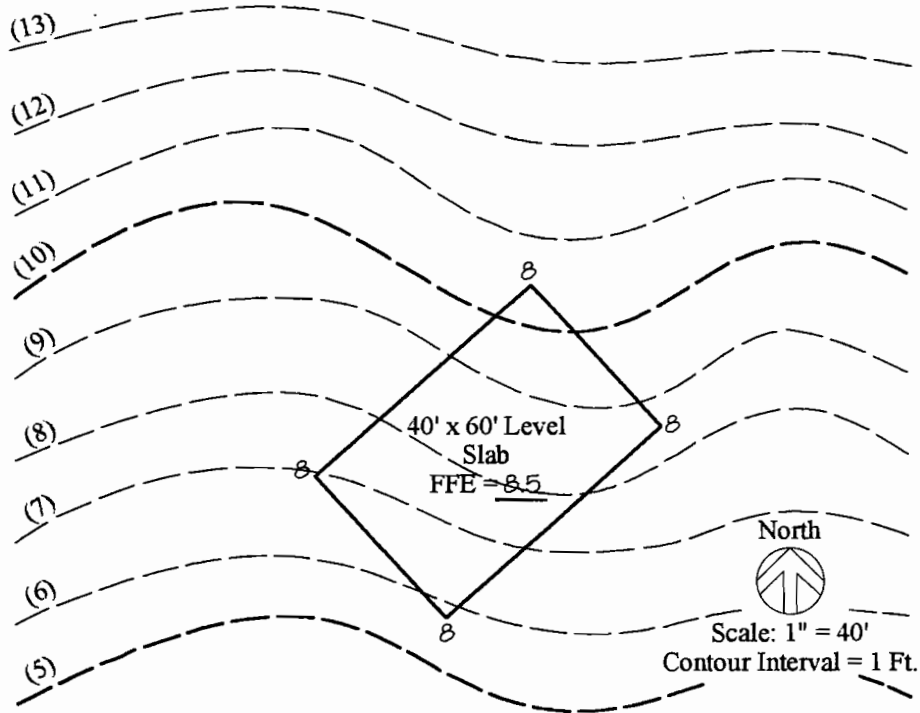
Setting The Finish Floor Elevation and Exterior Corner Points
